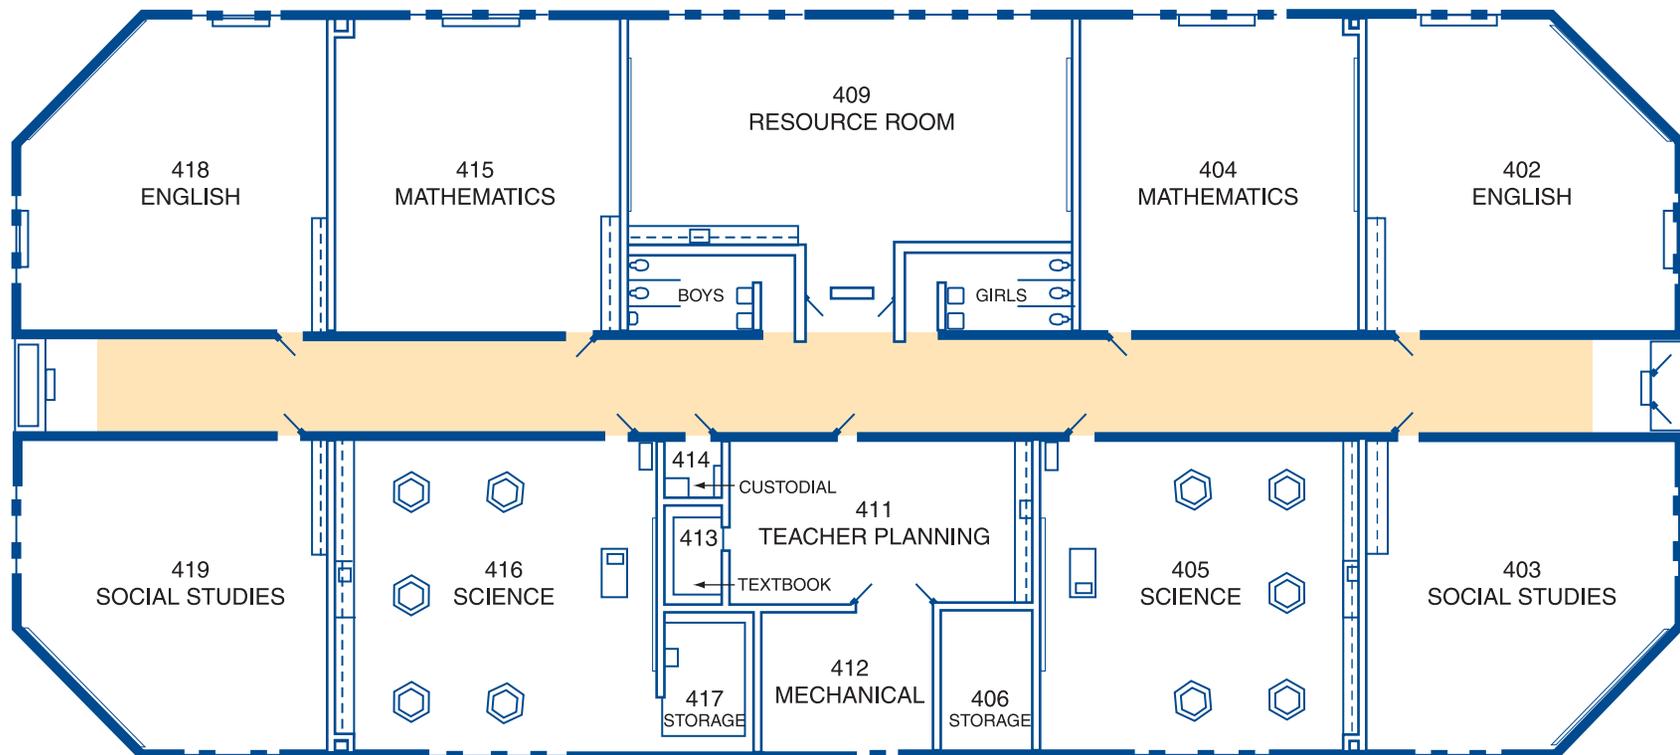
Best available refuge areas in the example school – corridors in Buildings 200, 400, 600, and 800.
